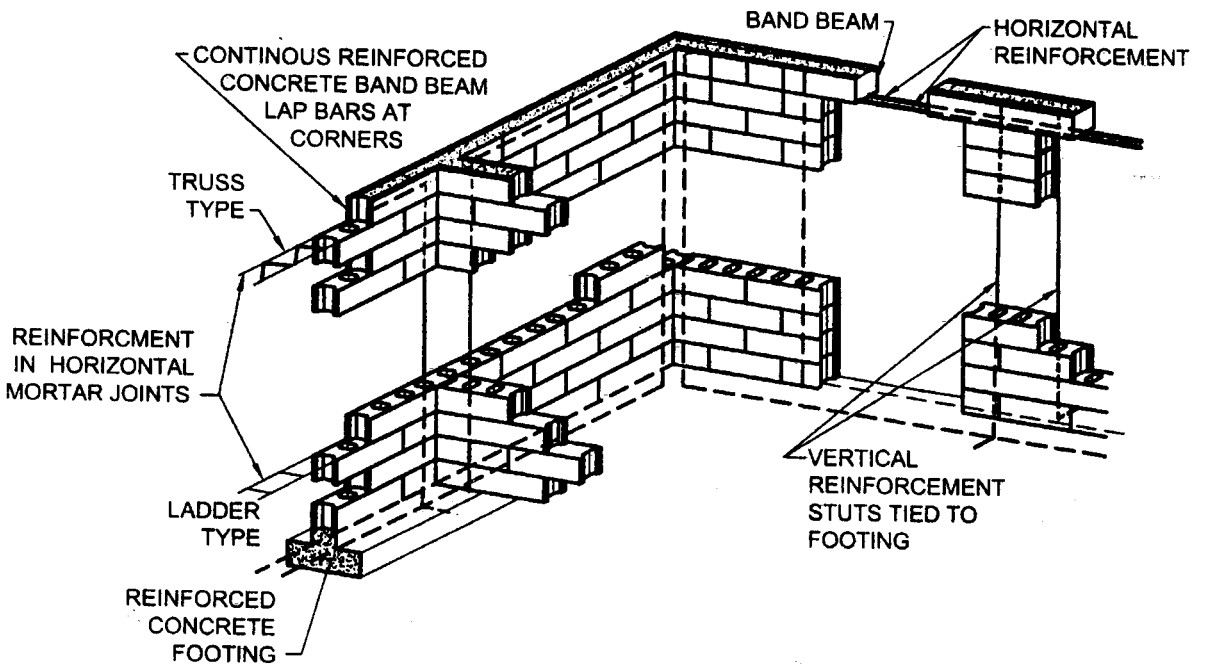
REINFORCEMENT TYPICAL DETAILS
